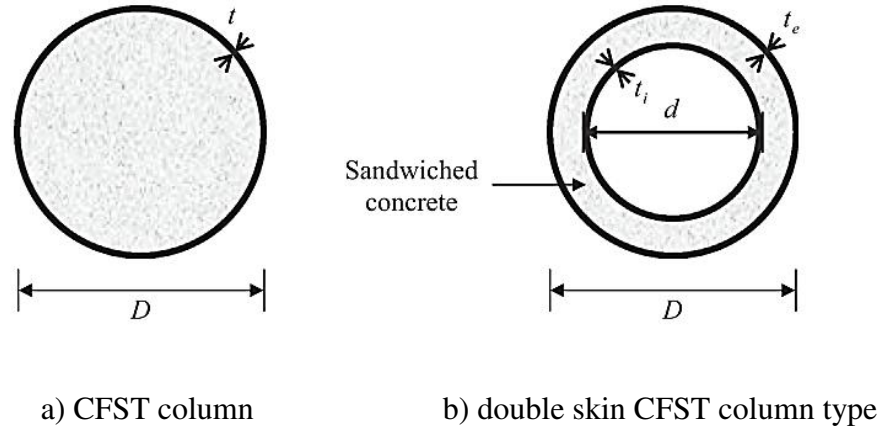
Details of CFST columns having circular cross section (Hassanein and Kharoob, 2014)
